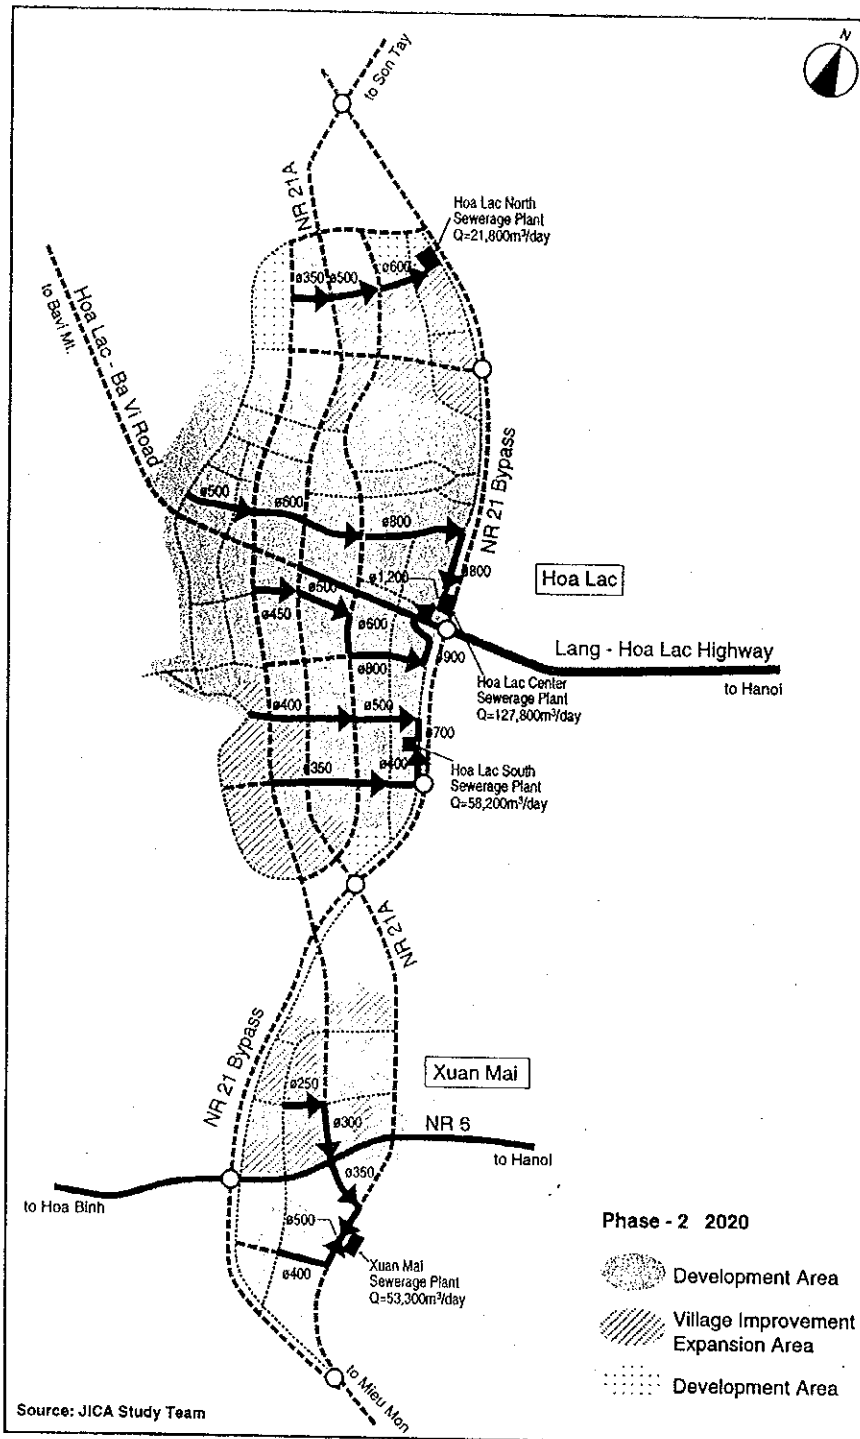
Sewerage Disposal Plan: Phase-2
